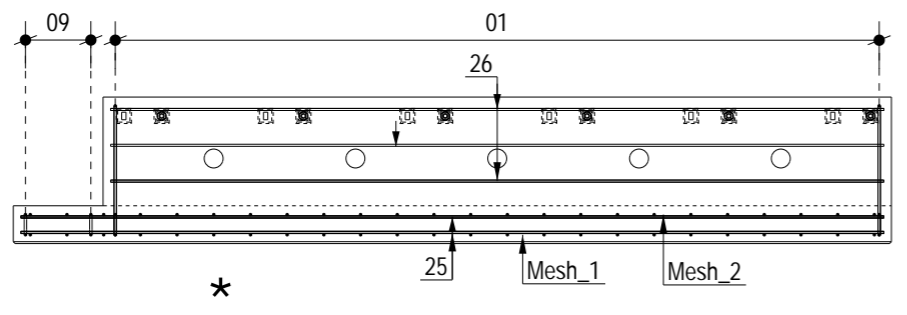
BYL-1462-PR-0007-RC1 Rev: C01
